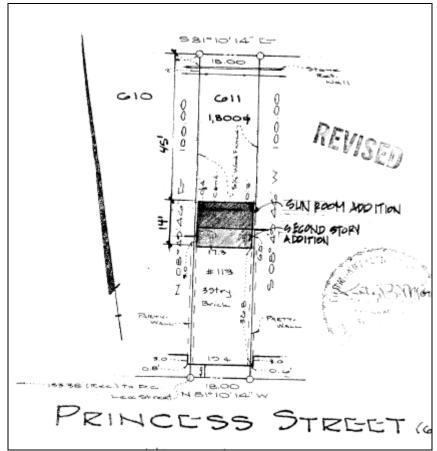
Plat of 113 Princess Street showing location of proposed rear addition.
